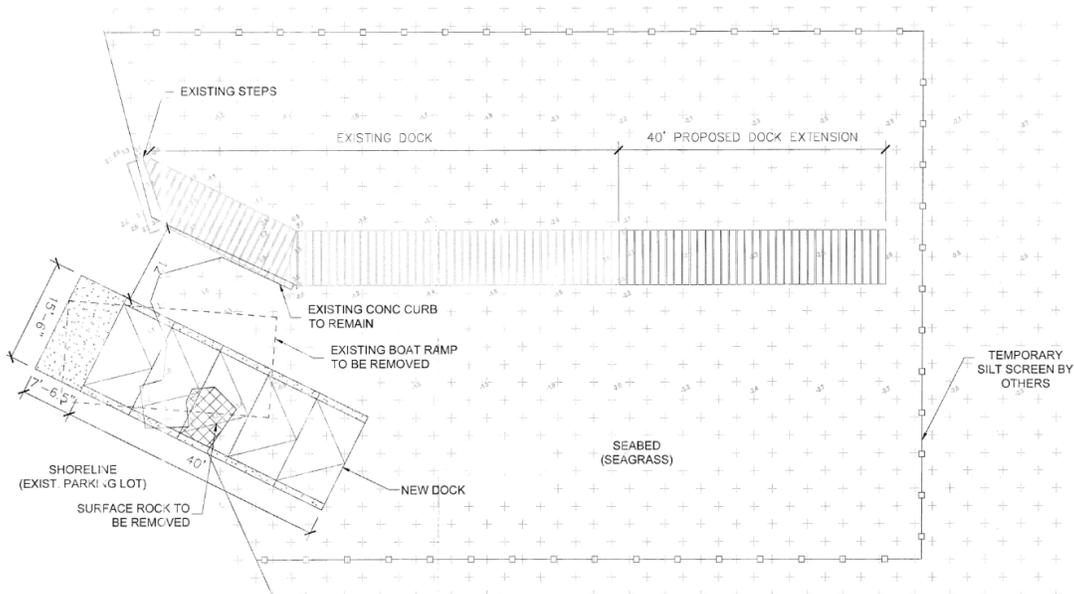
Plan extracts showing the proposed docks and boat slips (Reed Consulting Engineers 2019)
